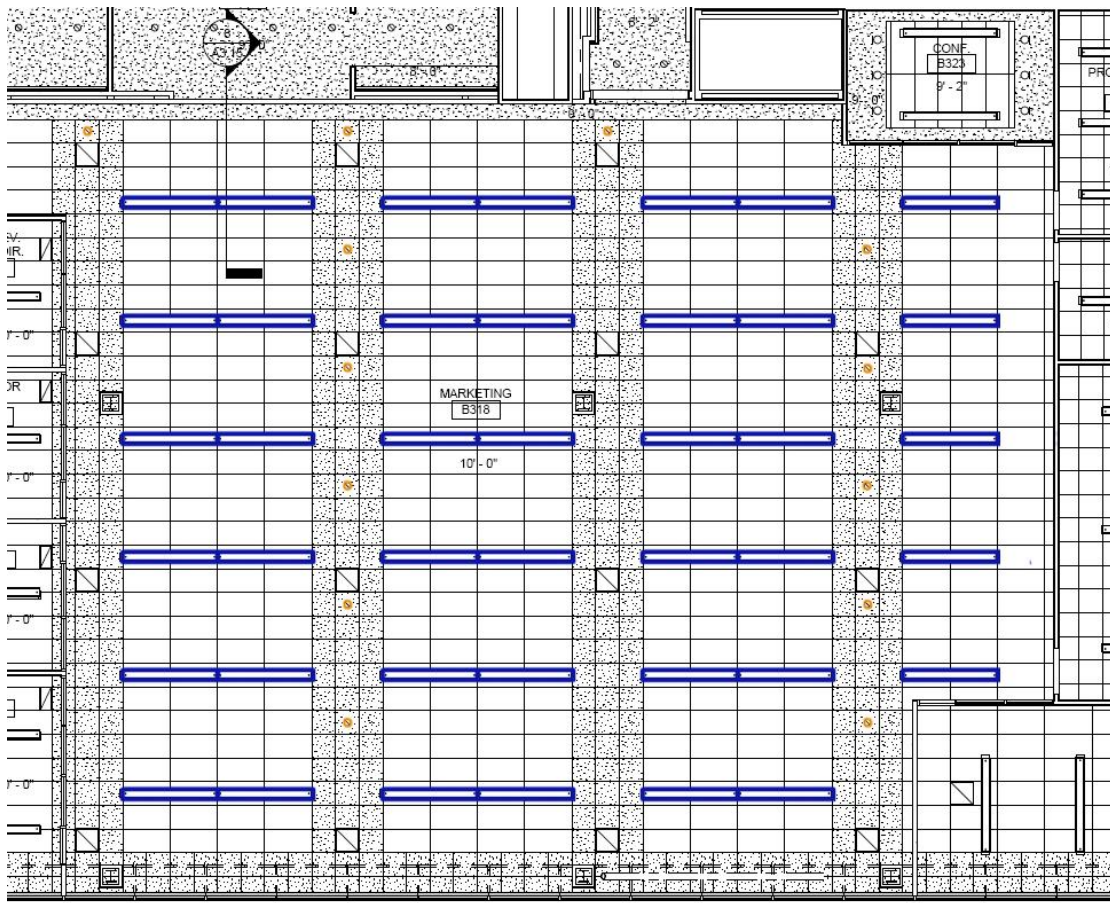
Marketing Office Enlarged Reflected Ceiling Plan
